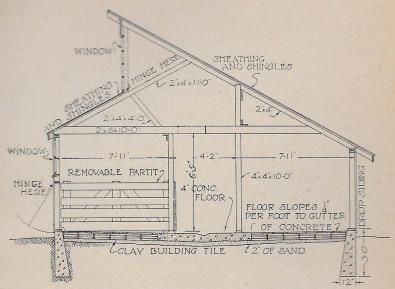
A cross section of south facing, half-monitor hog house No. 10.72-53, showing roof and floor construction.
